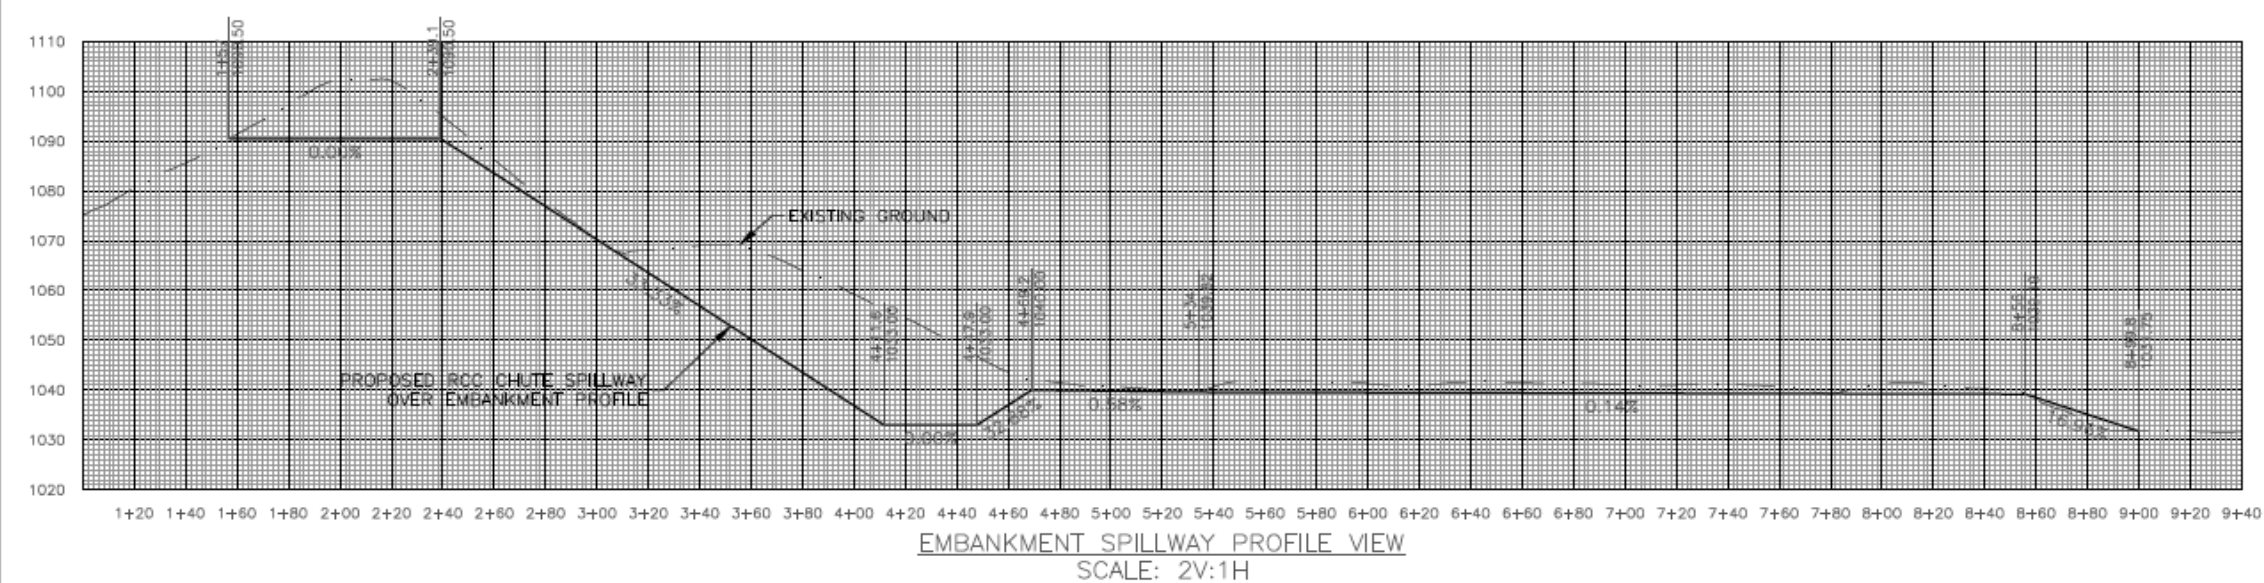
Alternative 5: Structural RCC Dam Plan and Profile – Overtop Dam
